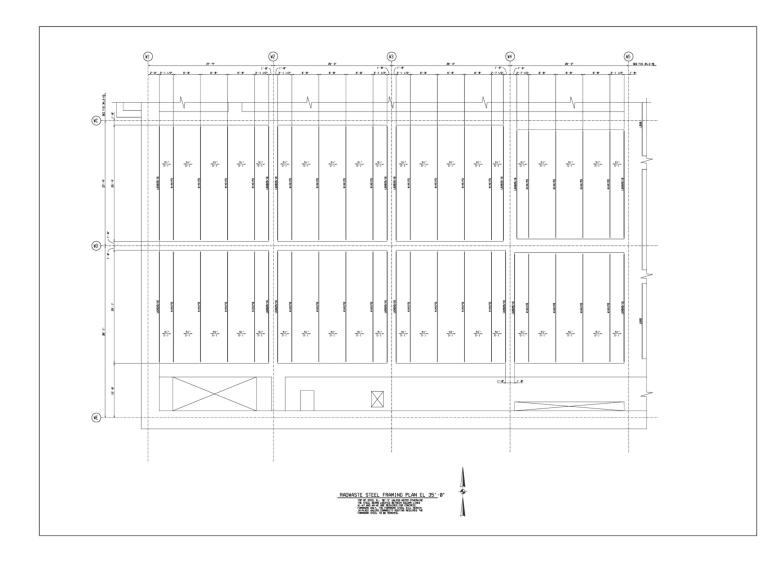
H.3-45 El 35'-0" Steel Layout Between Column Lines W1-W5 and WC-WE
